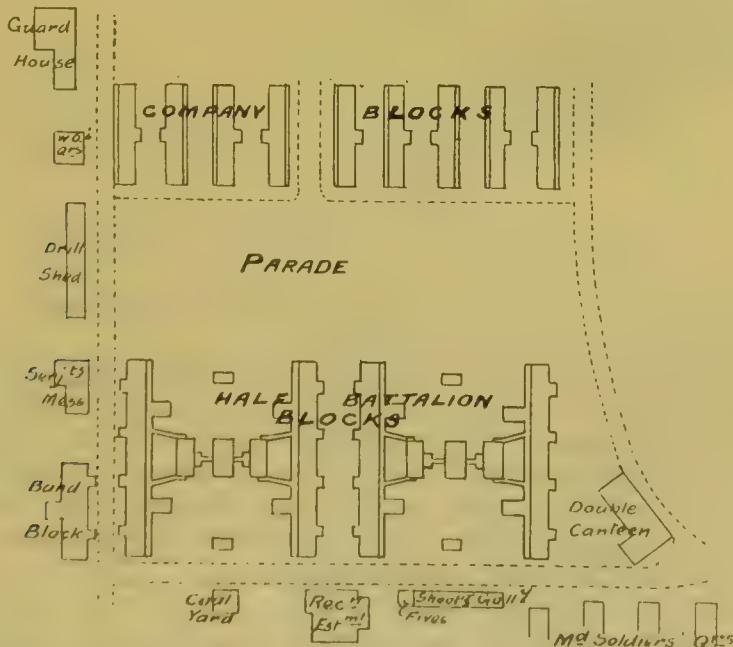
BLOCK PLAN OF OLD AND NEW TYPE OF BARRACK
